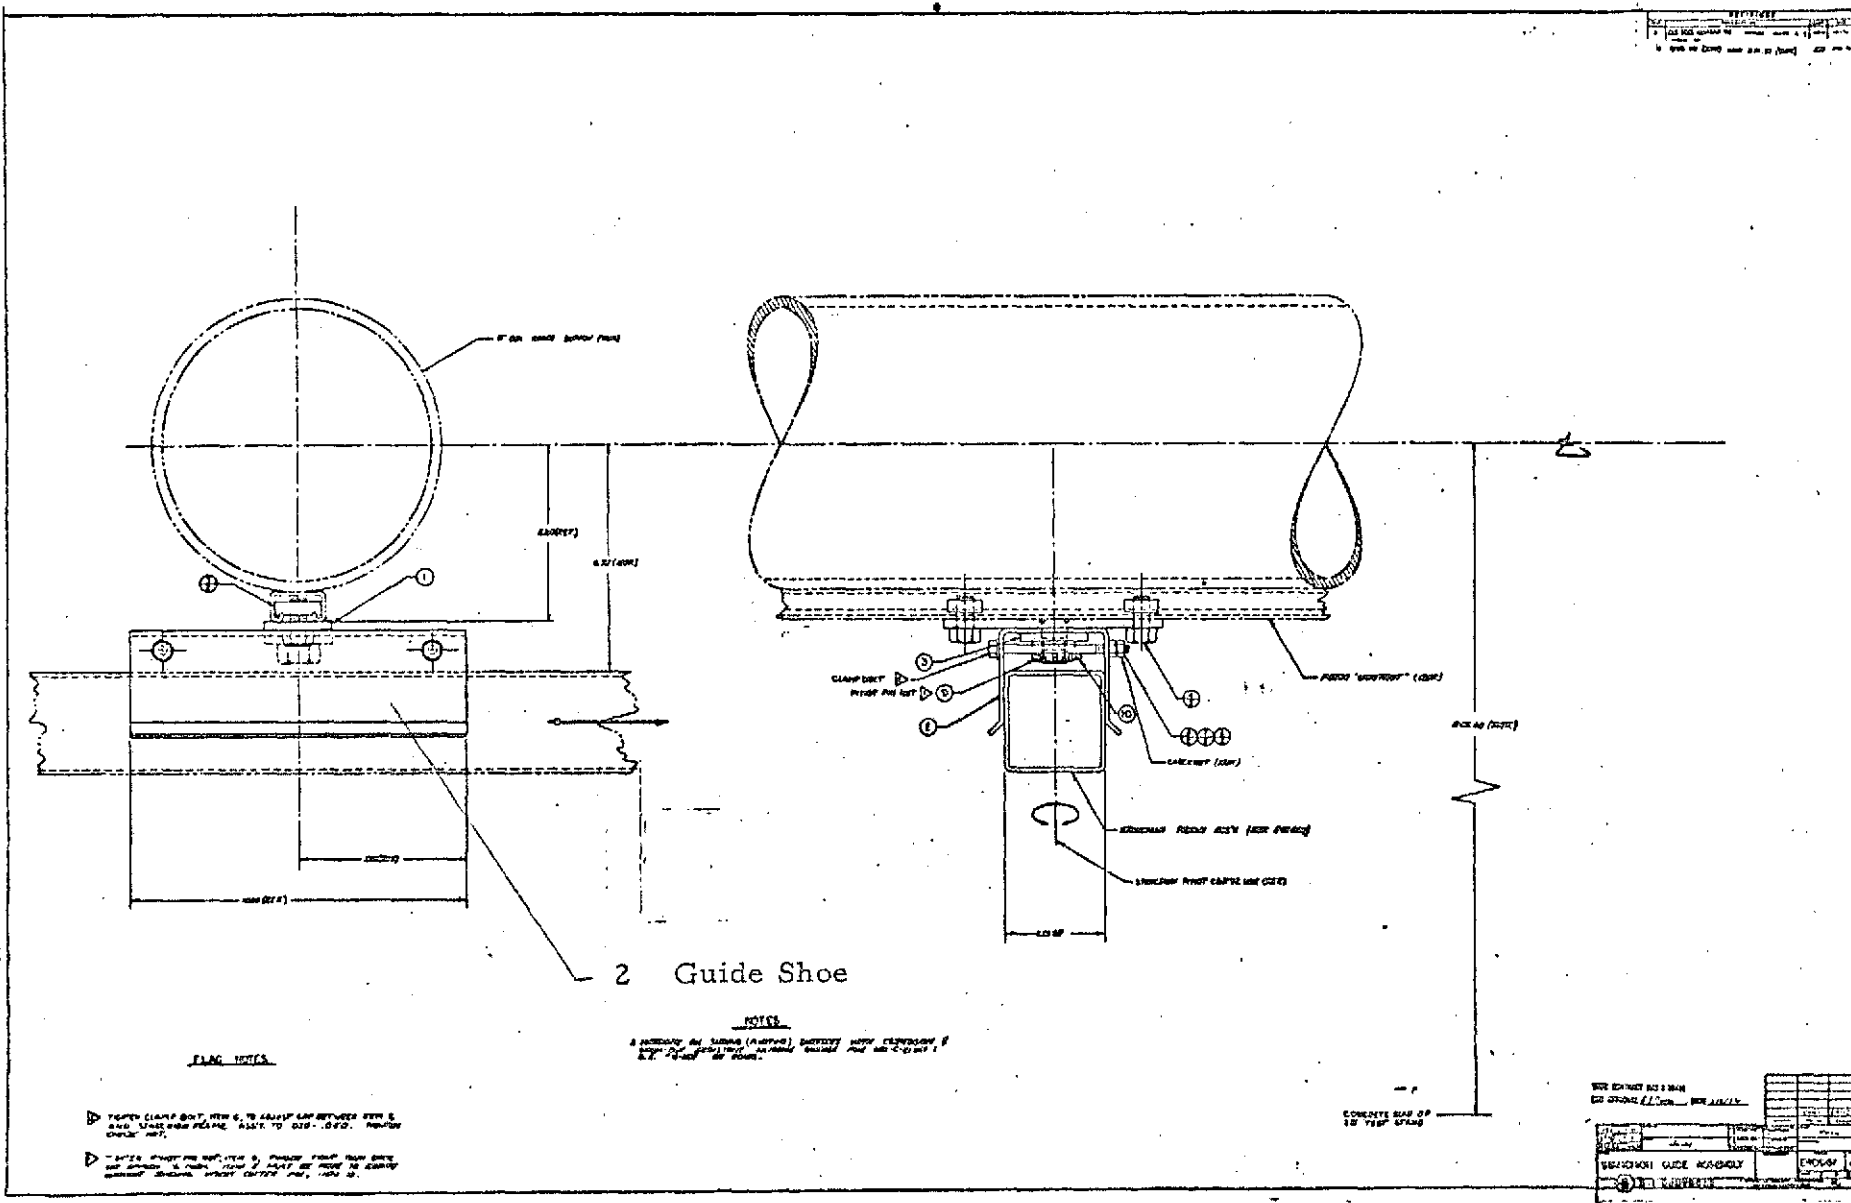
STANCHION GUIDE ASSEMBLY
